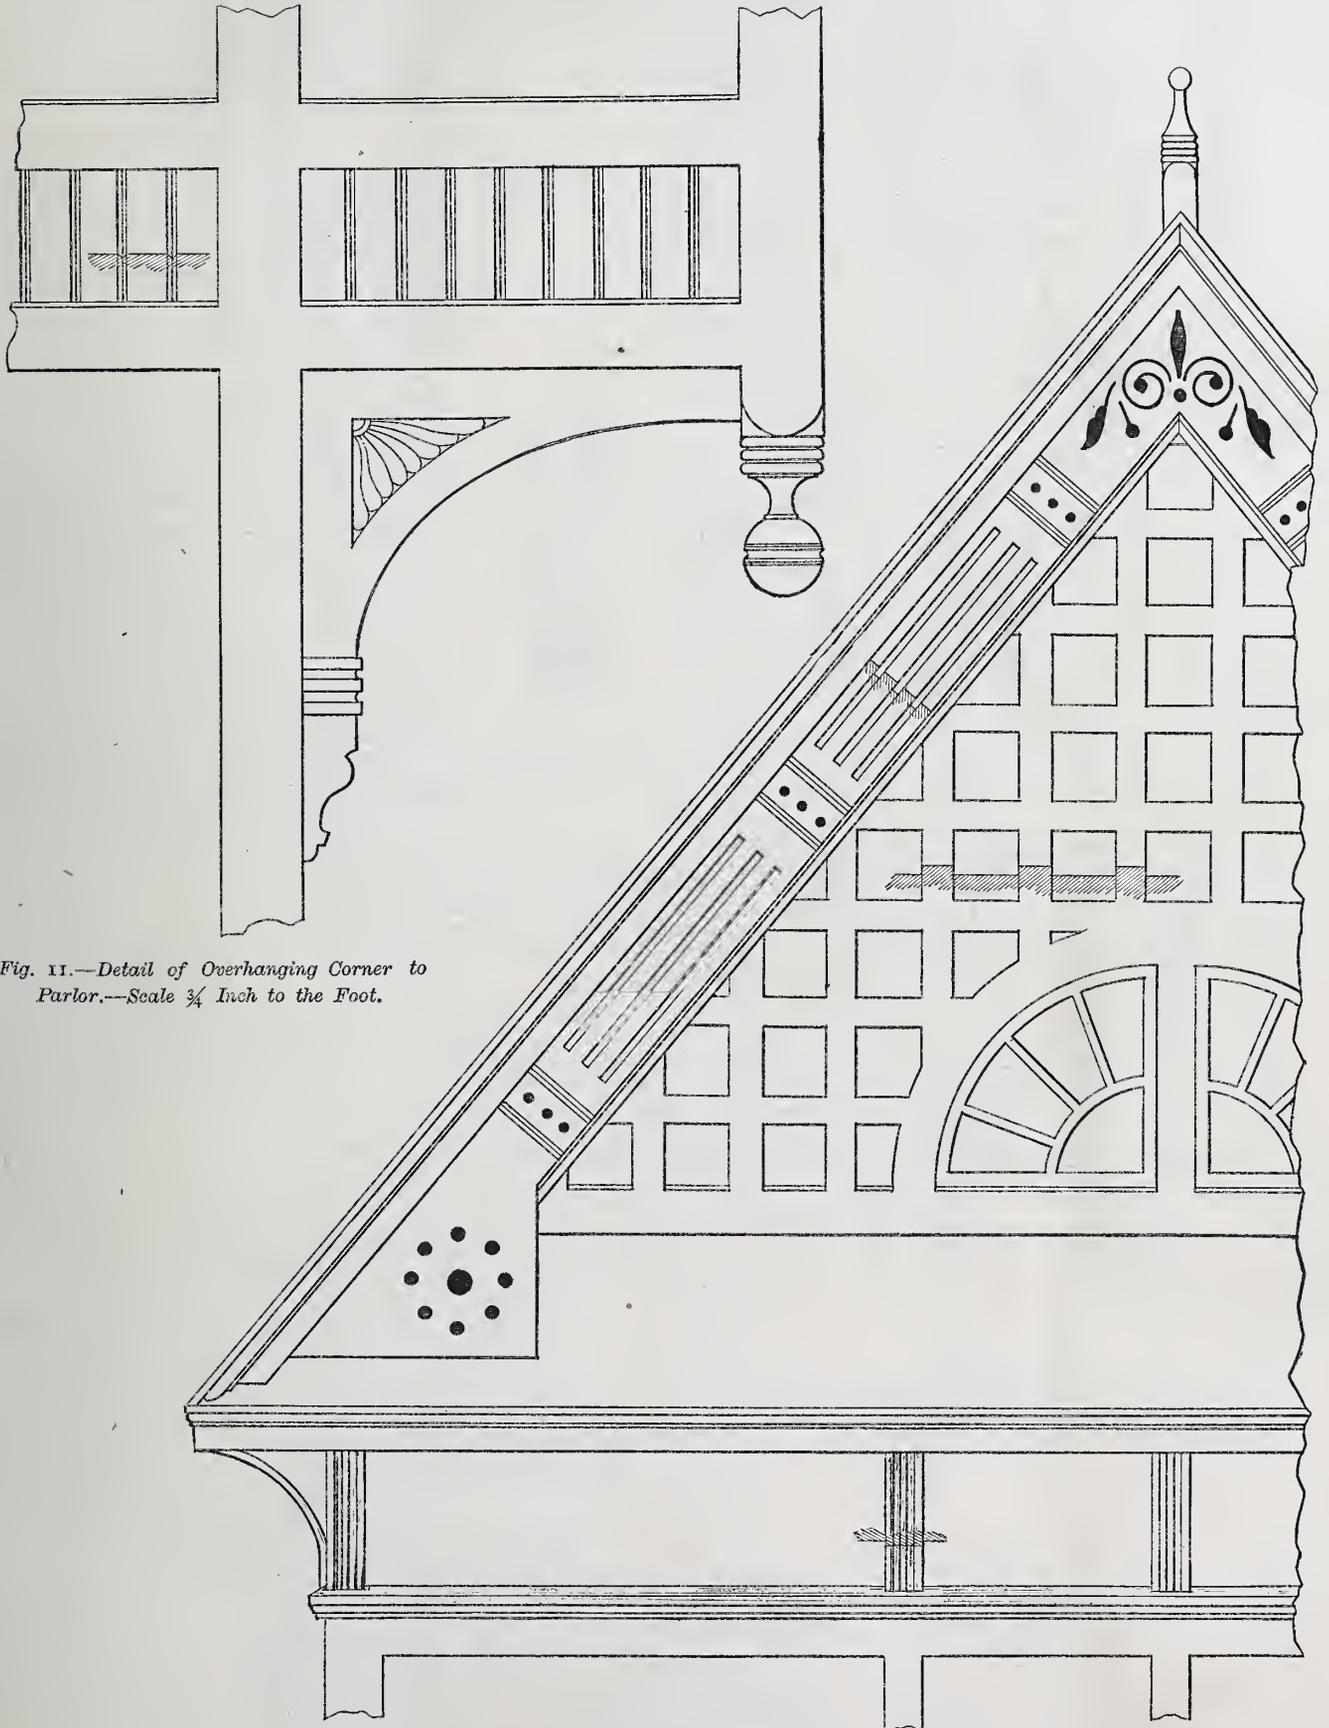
Detail of Overhanging Corner to Parlor.—Scale $\frac{3}{4}$ Inch to the Foot.
